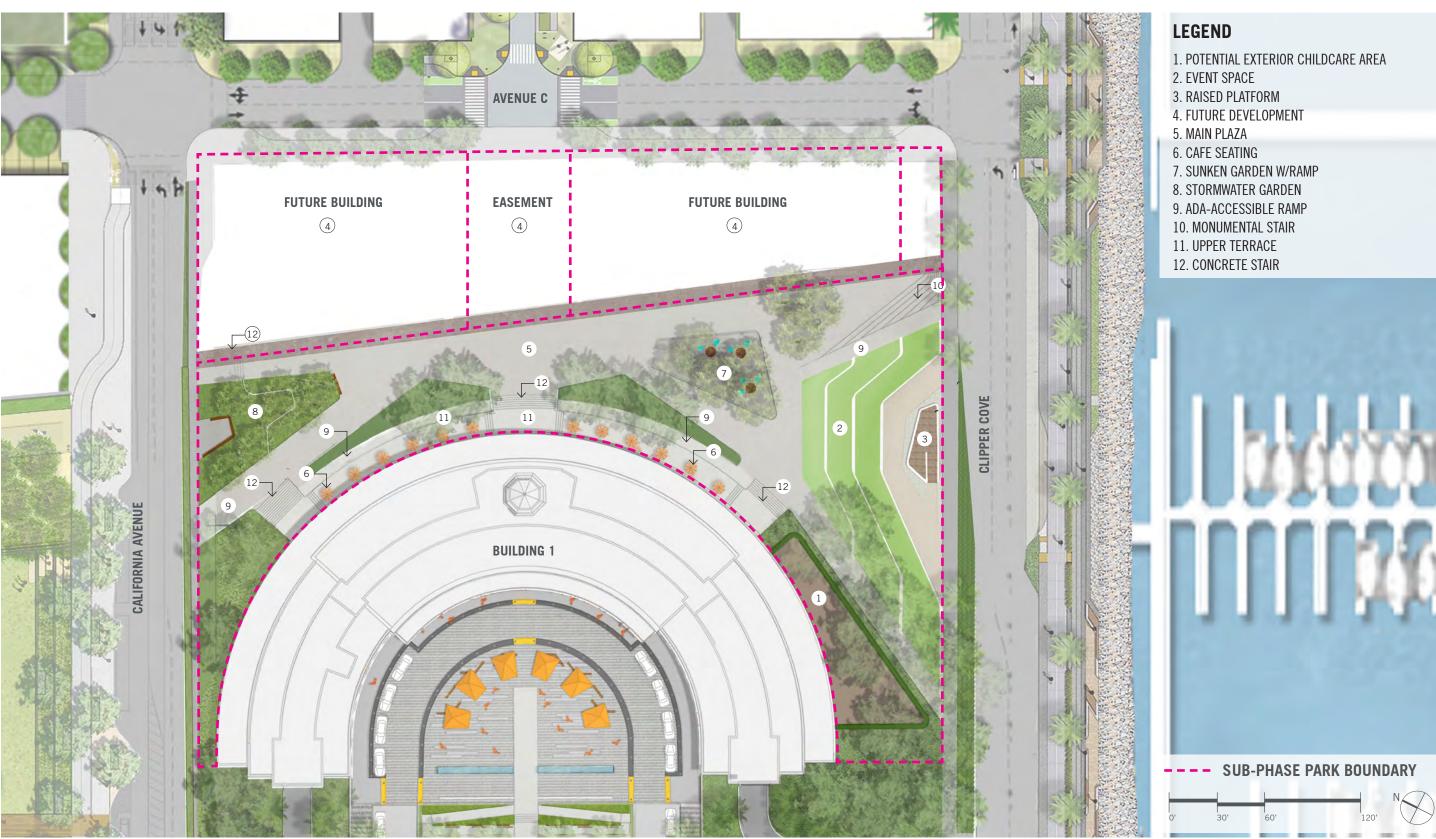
MARINA PLAZA ILLUSTRATIVE PLAN
